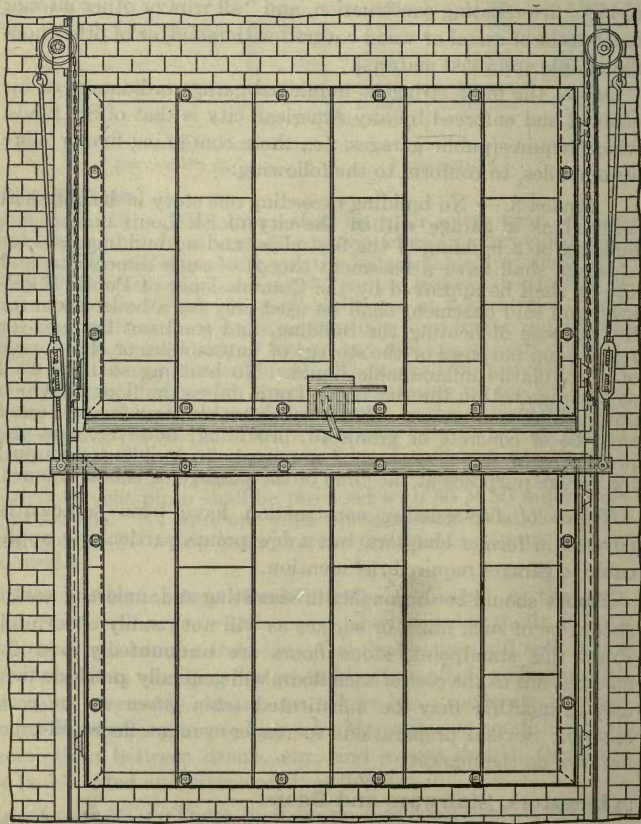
Elevation of "Peelle" Elevator Doors.
